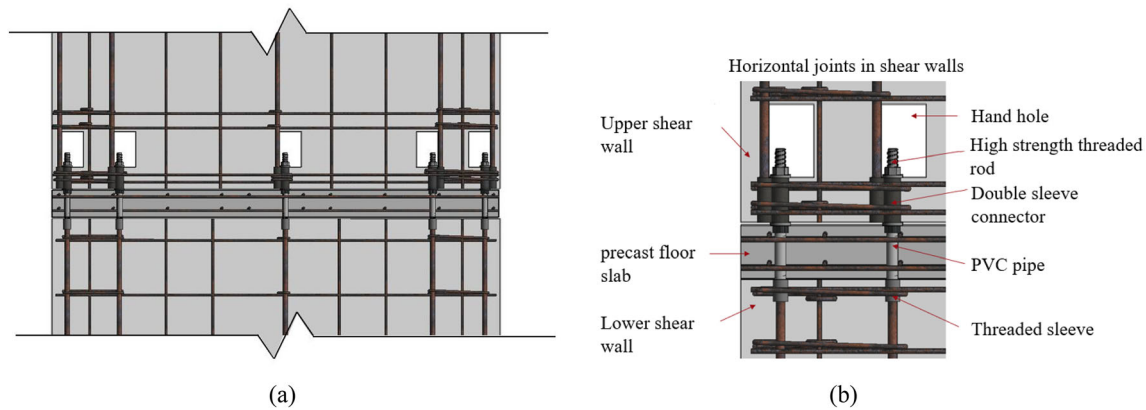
Sleeve and threaded rod connection: a Horizontal joint connection of shear wall; b Connection details
